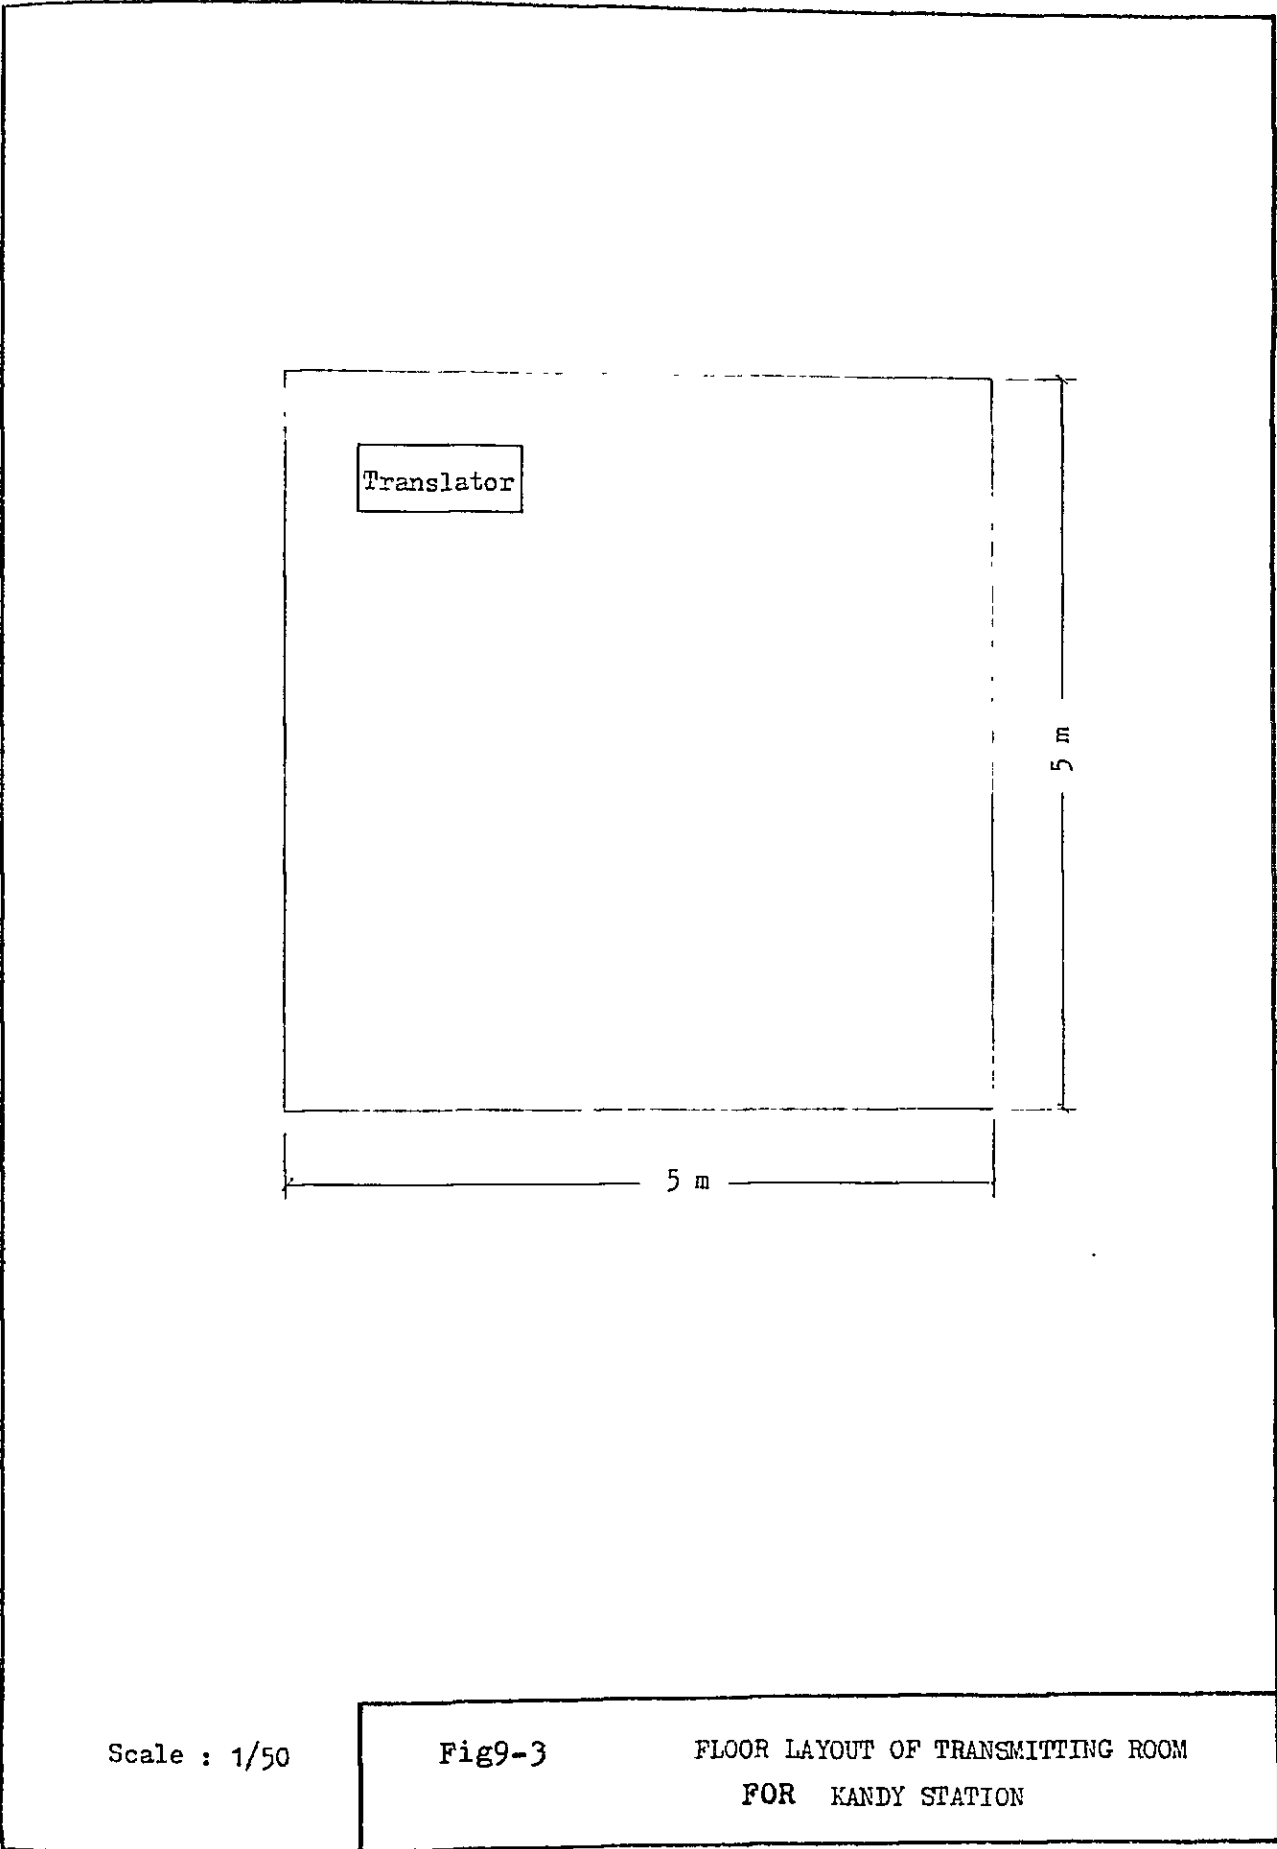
FLOOR LAYOUT OF TRANSMITTING ROOM FOR
